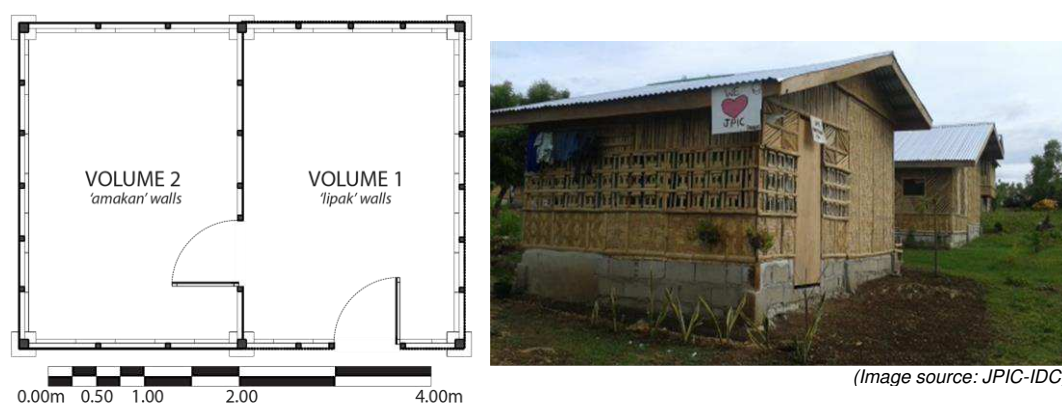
Floor Plan & Photo of JPIC Transitional Shelter
